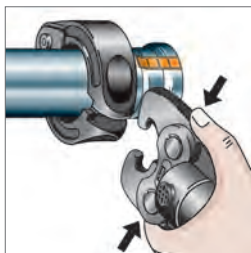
Place the press ring on the connector – open the hinged adapter jaw and place in the recesses of the press ring
